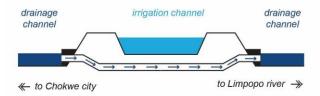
Detail of crossing "2" where the pipes going under the irrigation channel are collapsed
